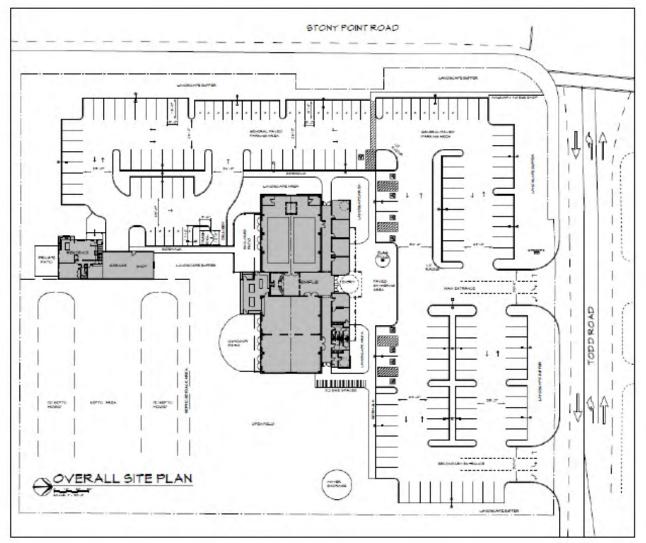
Site Plan (Source: Chuck Peterson Architect)
